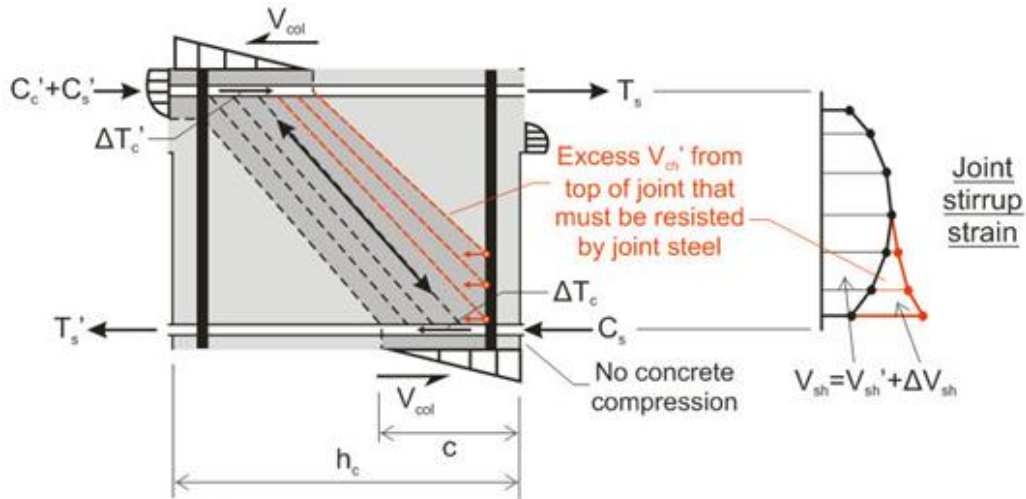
Interior slotted beam joint mechanism proposed by Au (2010)
